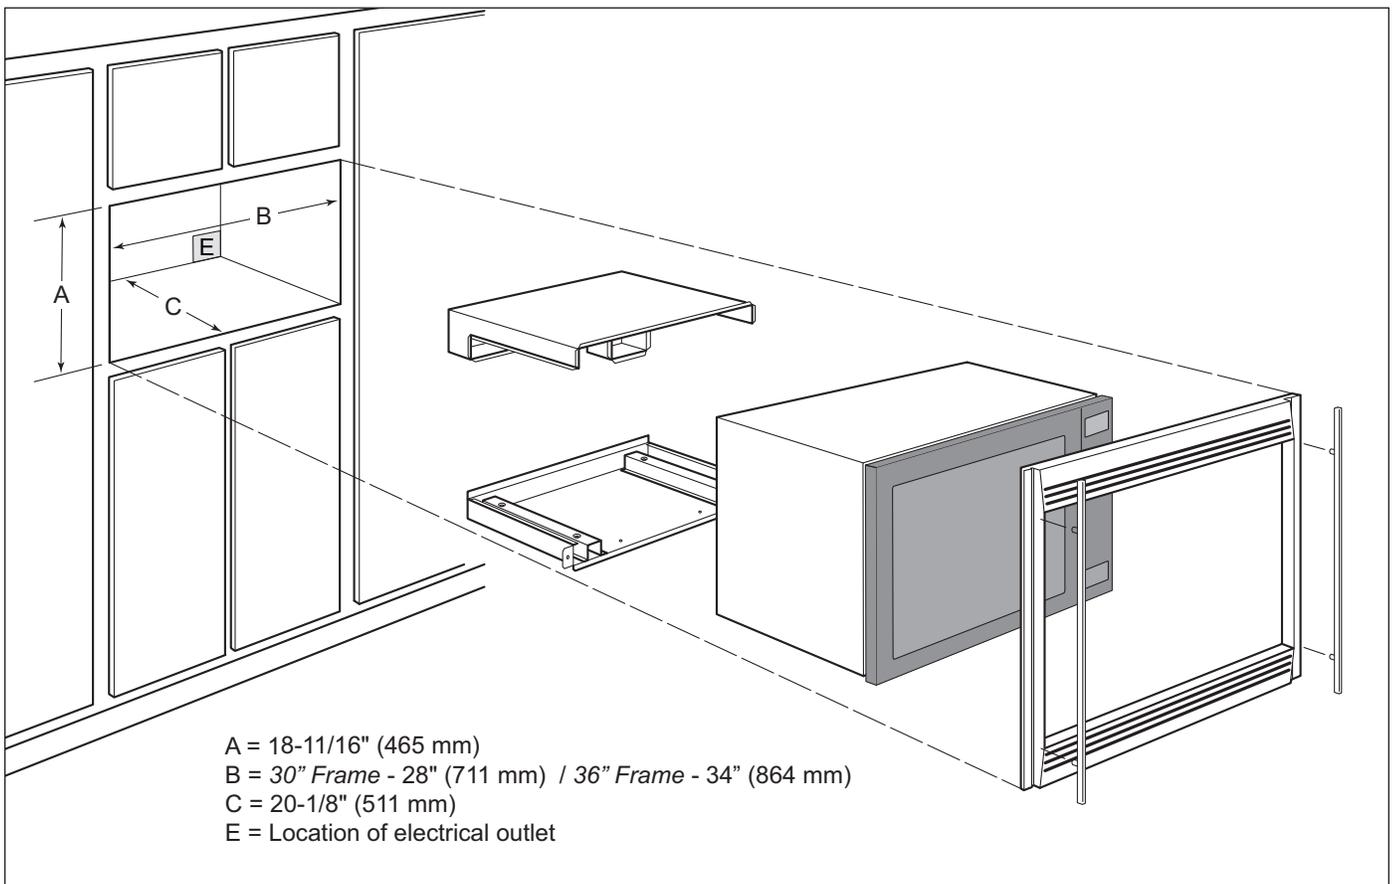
Rough-in Opening Dimensions and Trim Kit Installation
